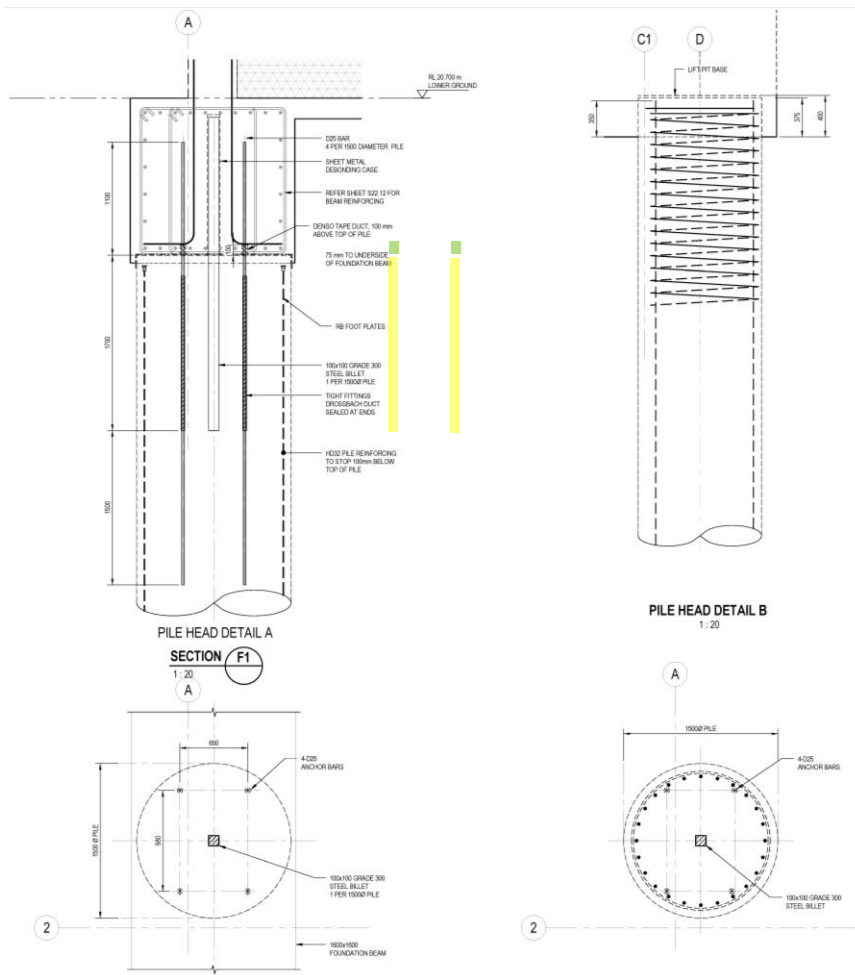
Detail showing “fuse” which was introduced to limit design actions in the piles and upper superstructure. (Yellow highlight indicates Drossbach ducts used to de-bond the reinforcing. Green highlight indicates top of Drossbach duct wrapped in Denso tape to prevent binding)
